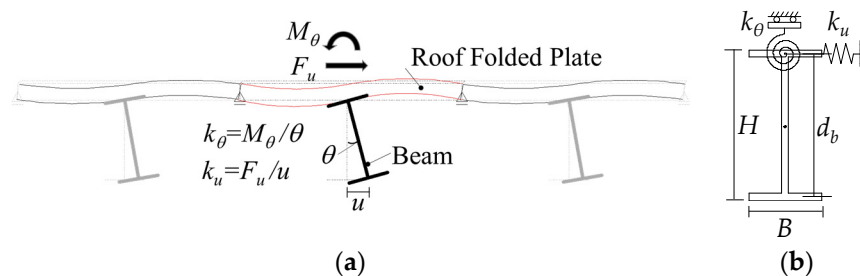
Continuous stiffening for lateral buckling deformation of H beams. (a) Stresses in roof folded plates and (b) stiffness of the spring.
